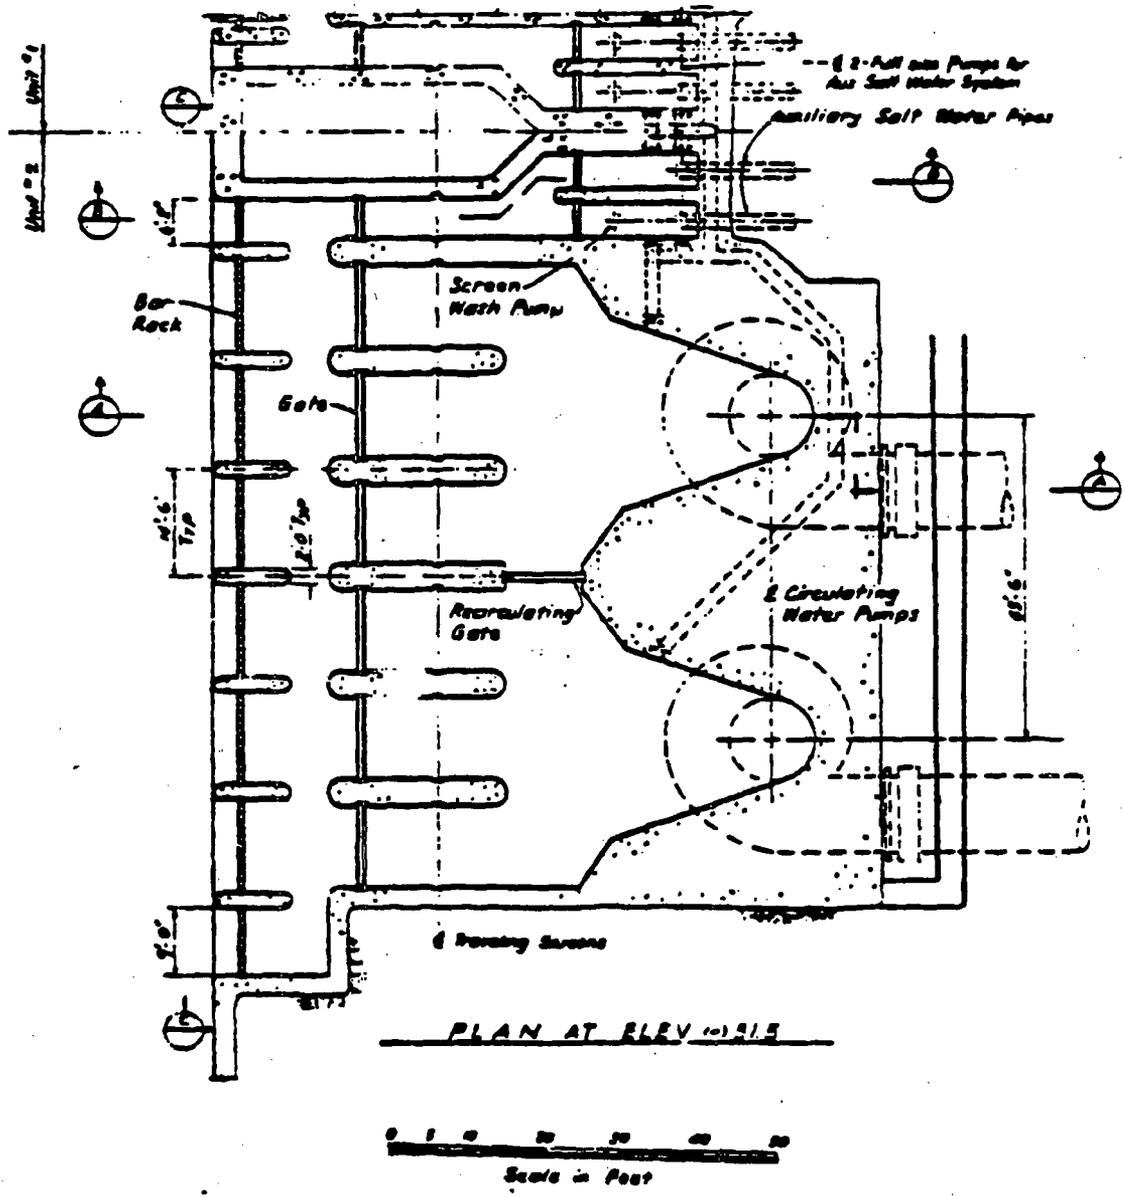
Plan view of cooling water intake structure, Diablo Canyon Power Plant.
